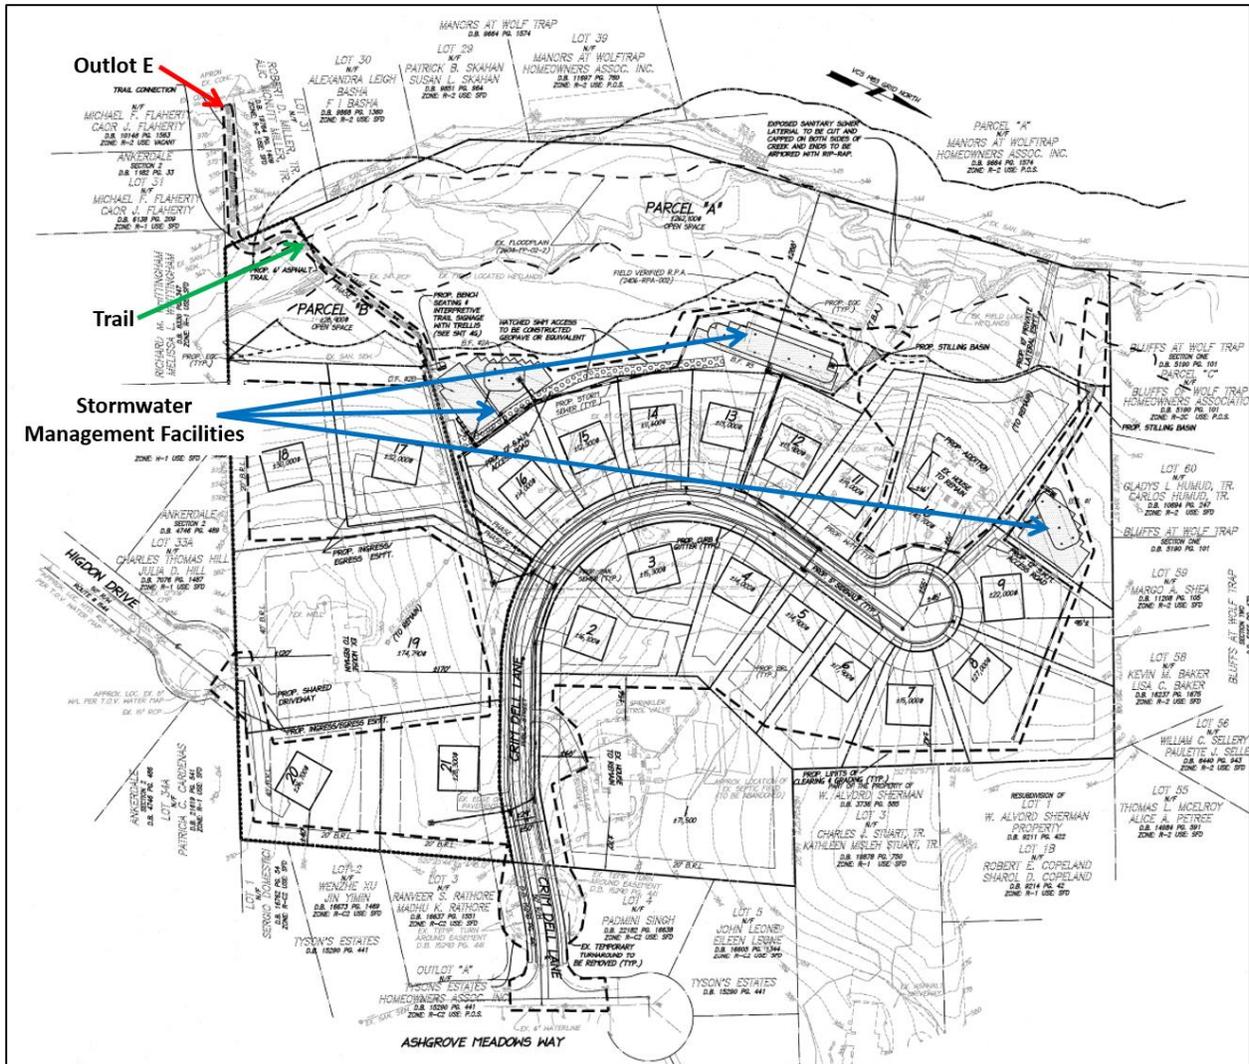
Source: Sheet 2, CDP/FDP with added annotations
